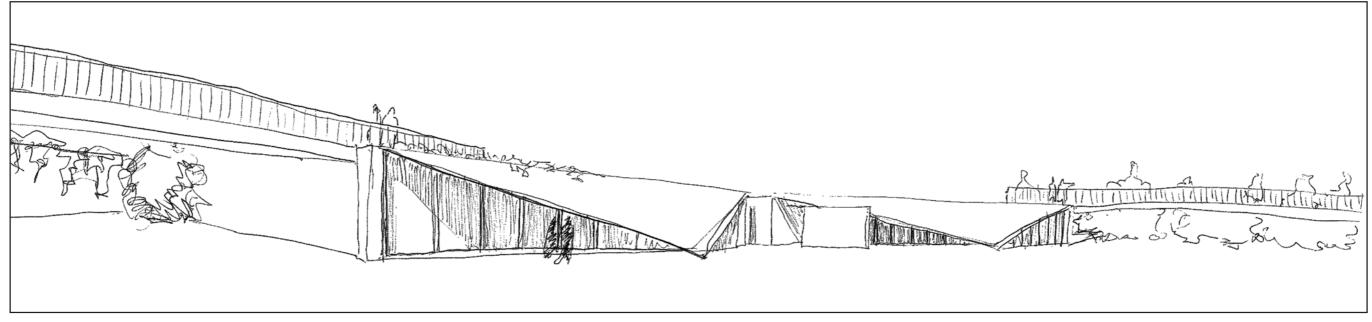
ELEVATED WALKWAY CONCEPT PROPOSAL,
